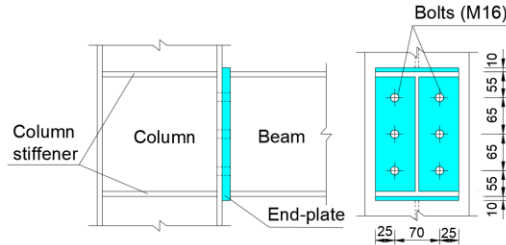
Schematic outline of beams connected to columns by end-plate joints (all dimensions are in mm)
